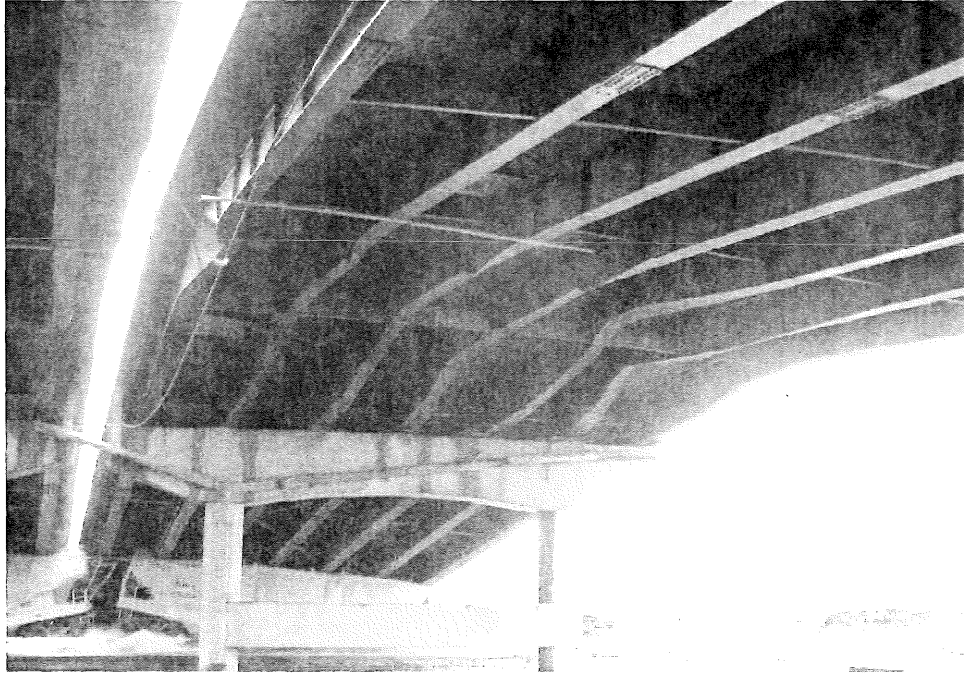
Plastic hinging in the steel girders north of Pier 9, looking south.
